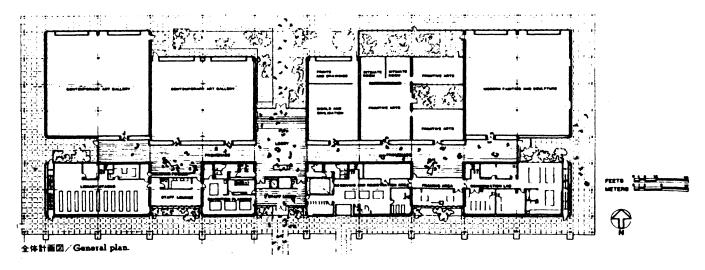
Ground floor plan, North-South section, Menil Collection. from Renzo Piano, Buildings and Projects 1971-89 (NewYork: Rizzoli, 1989).
